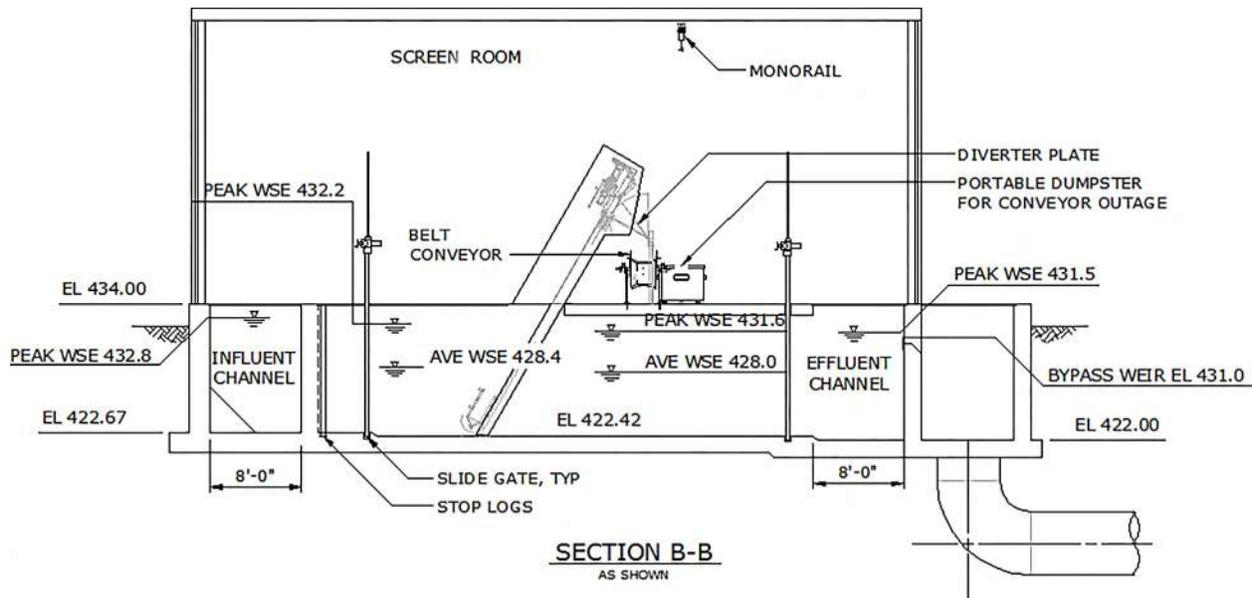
Alternative 2 Facility Section with Initial Hydraulic Elevations
